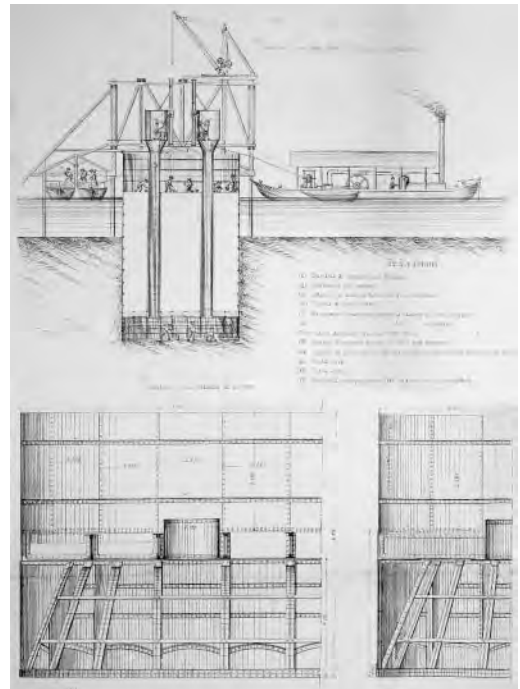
Pontelagoscuro Bridge: the sinking process of the piers and construction details of the caisson (Ratti 1876).
